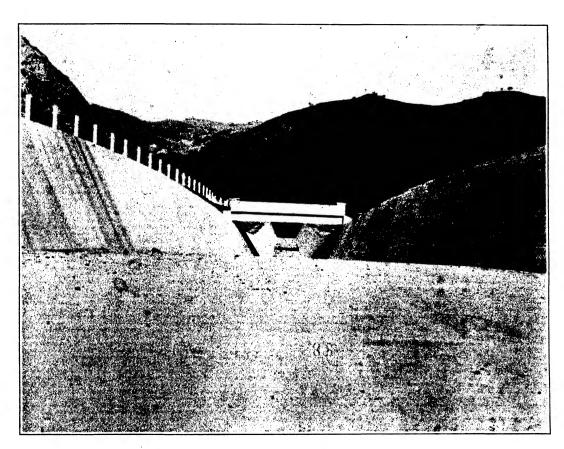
Reconstructed Calaveras Dam. View at spillway looking downstream from crest,
